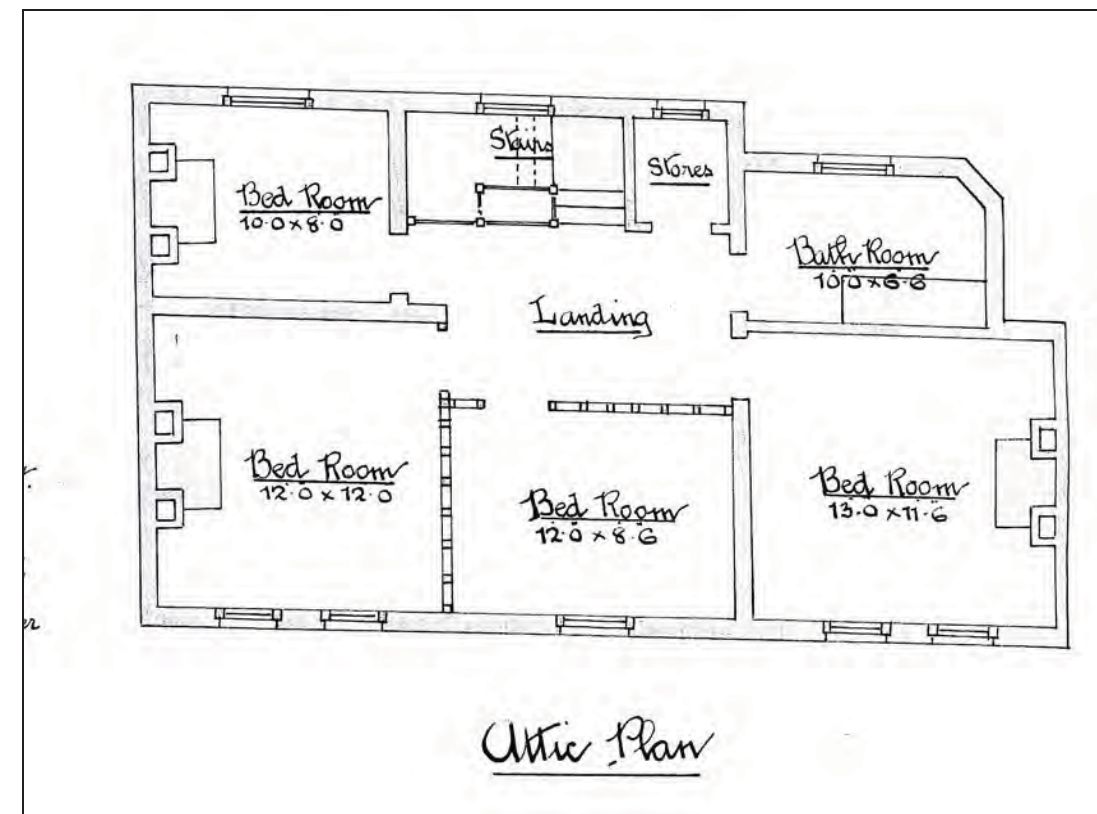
LBR Plan 3666 of 1896. No. 10 Northgate Street attic plan, not shown to scale.
